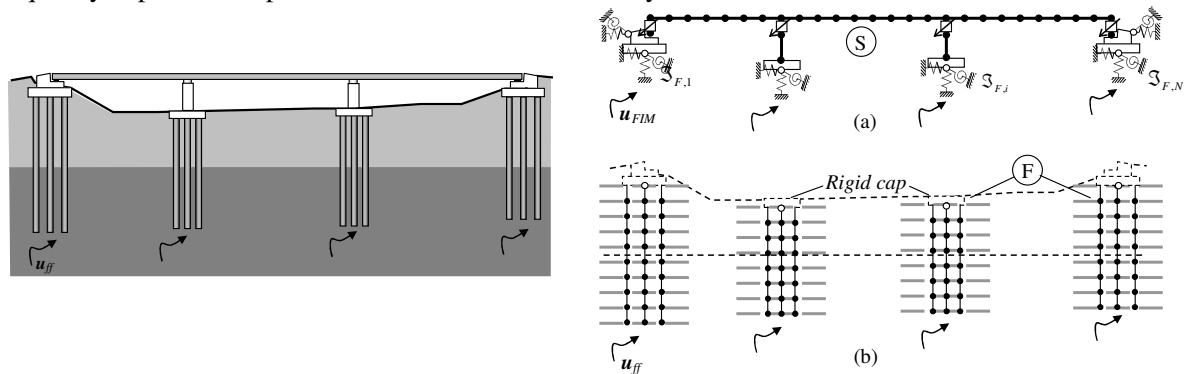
Substructure approach: (a) bridge on compliant base and (b) soil-foundation system
